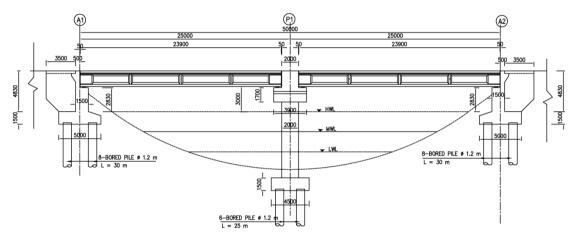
Steel-I Girder (Continuous Girder)
